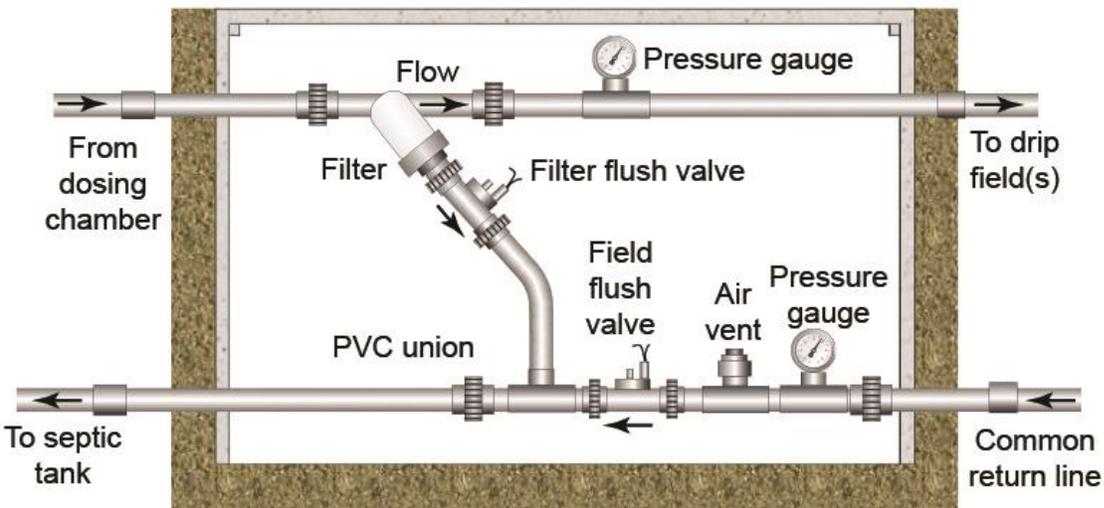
Cross-sectional view of typical filter, valve, and meter assembly for a noncontinuous flush system.
